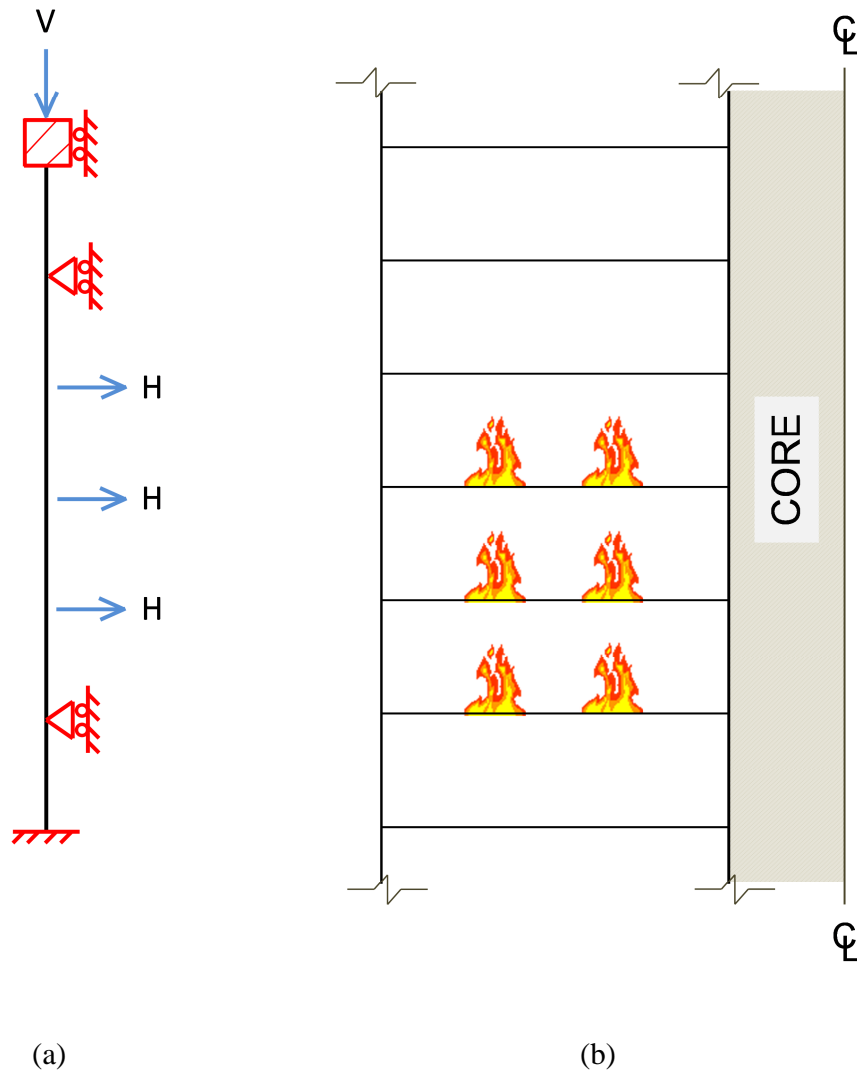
(a) Structural model of a multi-storey column under vertical and horizontal loads, (b) Elevation sketch of a typical tall building under multiple floor fires.
